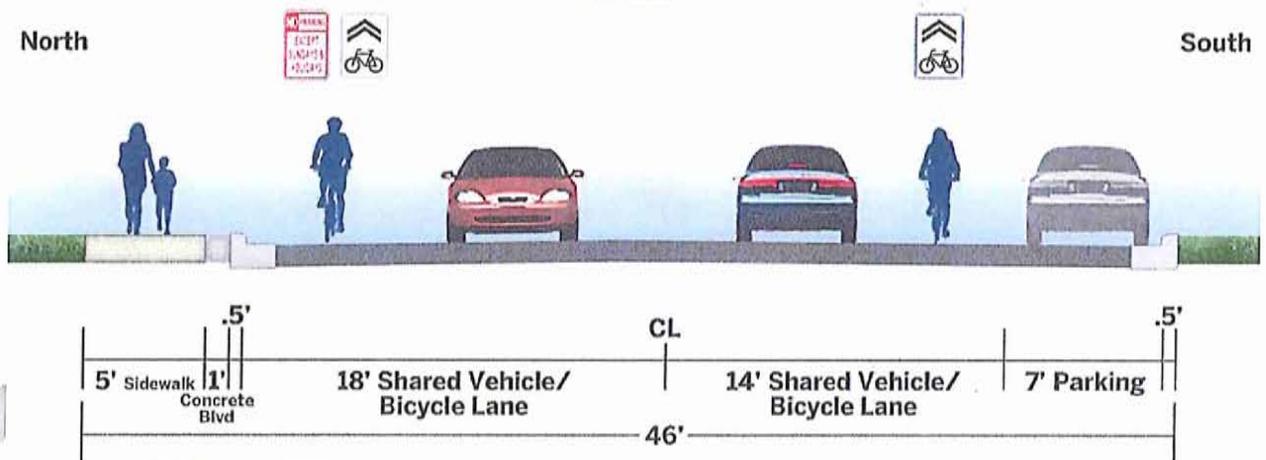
54th Street East Segment Typical Section – for 350-feet East of Minnehaha Boulevard - North Side Parking on Sunday Only
